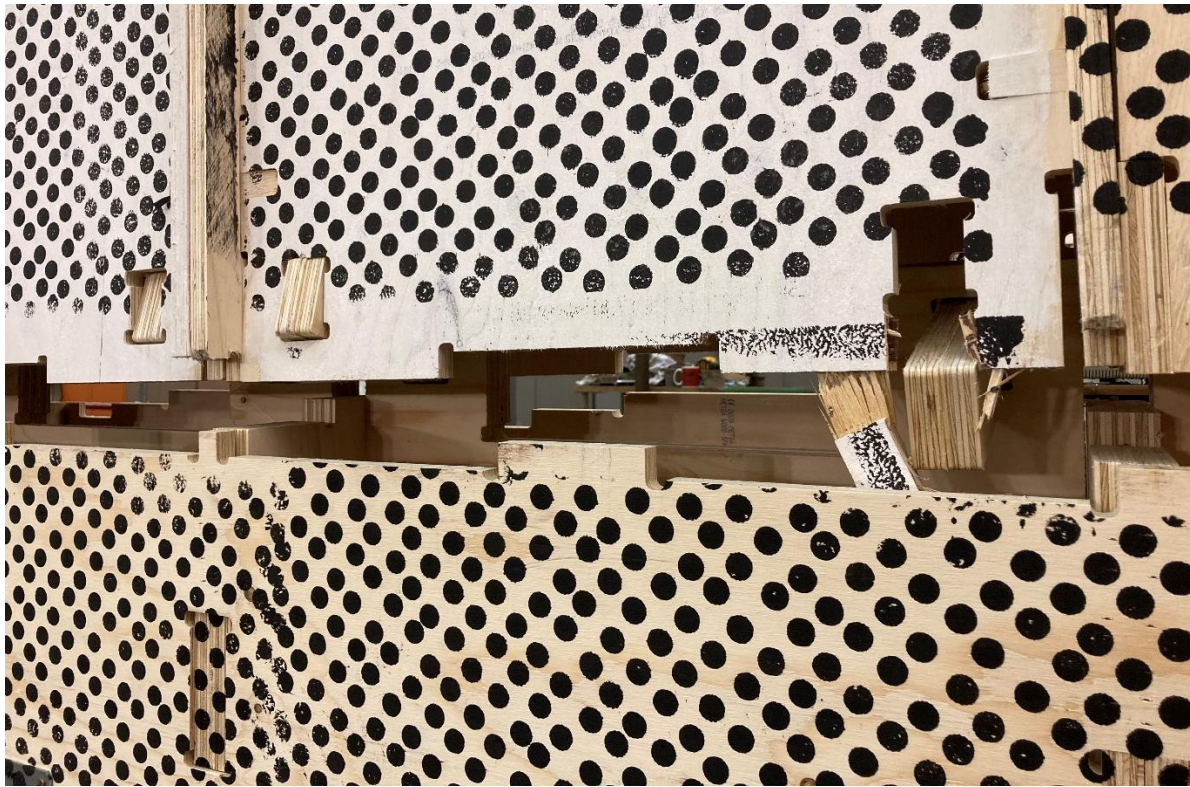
Failure of the Wall to Foundation Beam Uplift Connection
